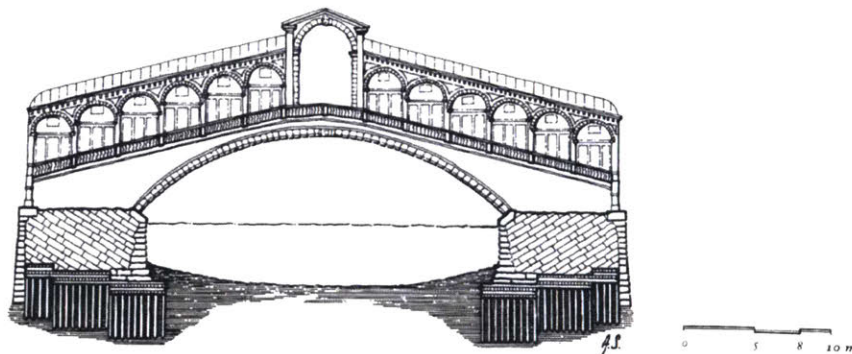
Foundations of the Rialto Bridge, Venice from 1340 (Mark 1993)
